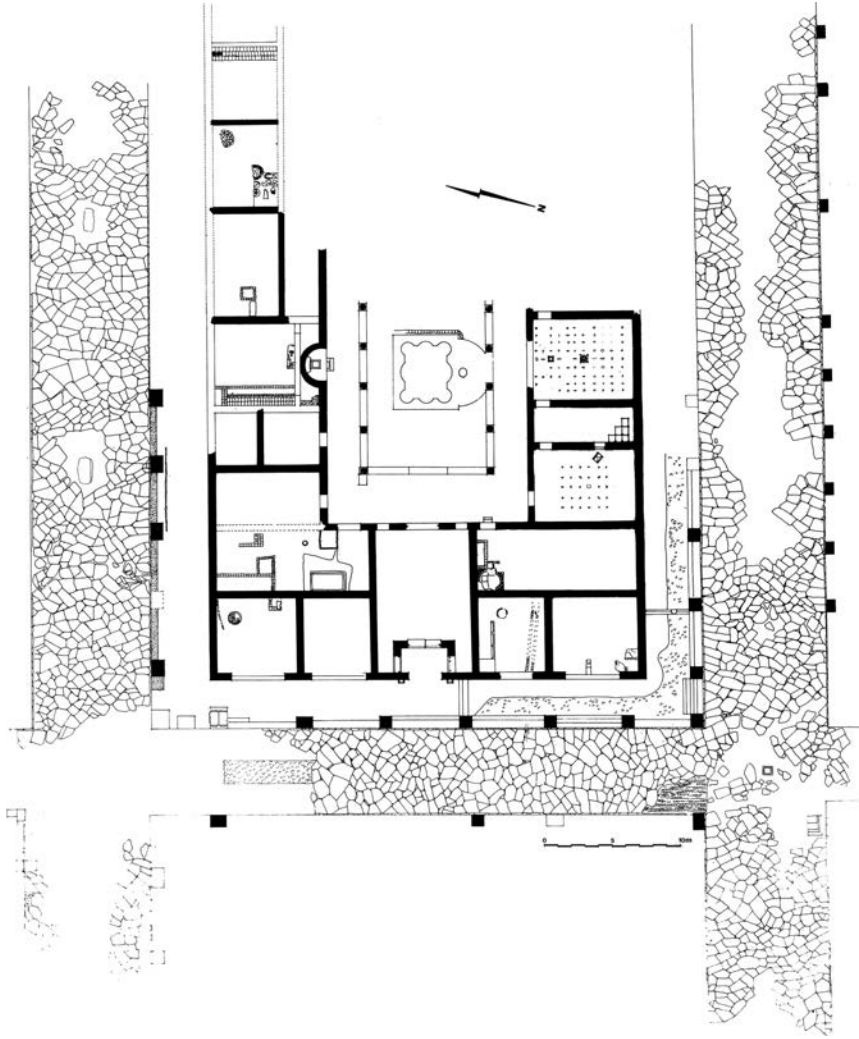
House de la Cañada Honda, Italica, Spain, plan, after Luzón 1982, 449, plan 2.
